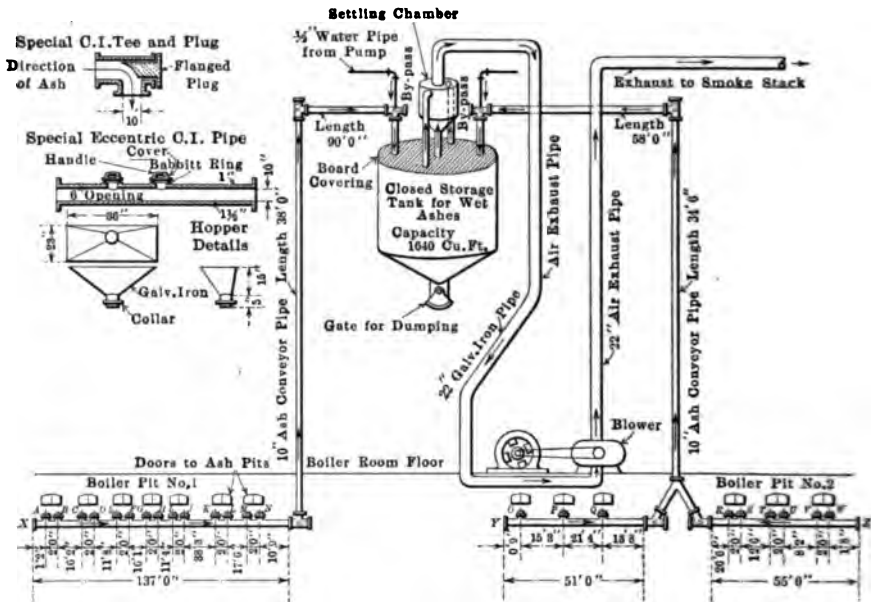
Diagrammatic view of pneumatic ash-conveyor plant, Armour Glue Works, Chicago, Ill.
